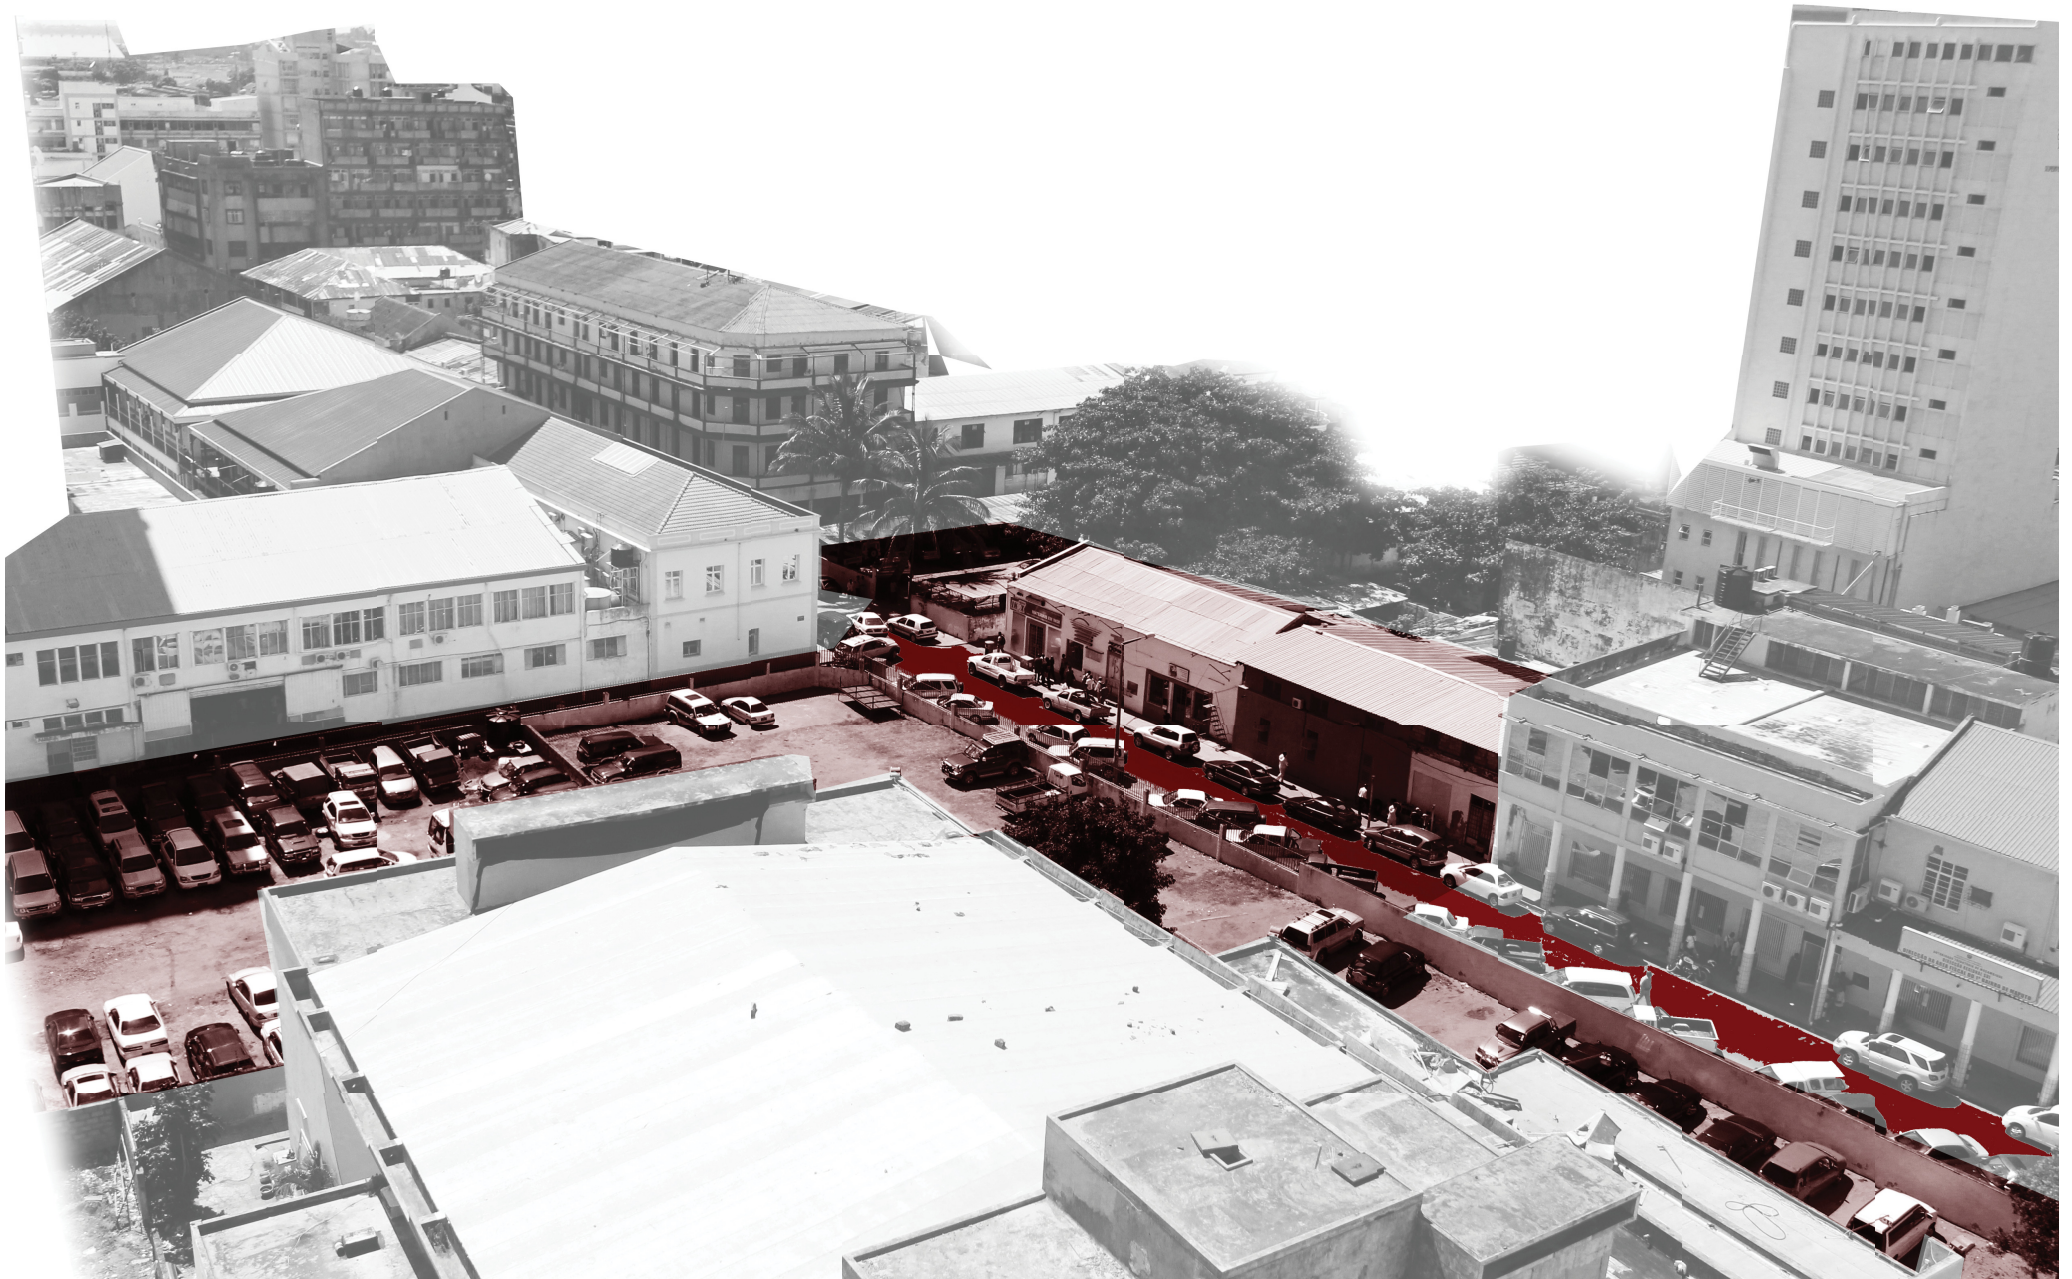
Photograph showing position of architectural intervention site plan. Photograph by Author 2011
